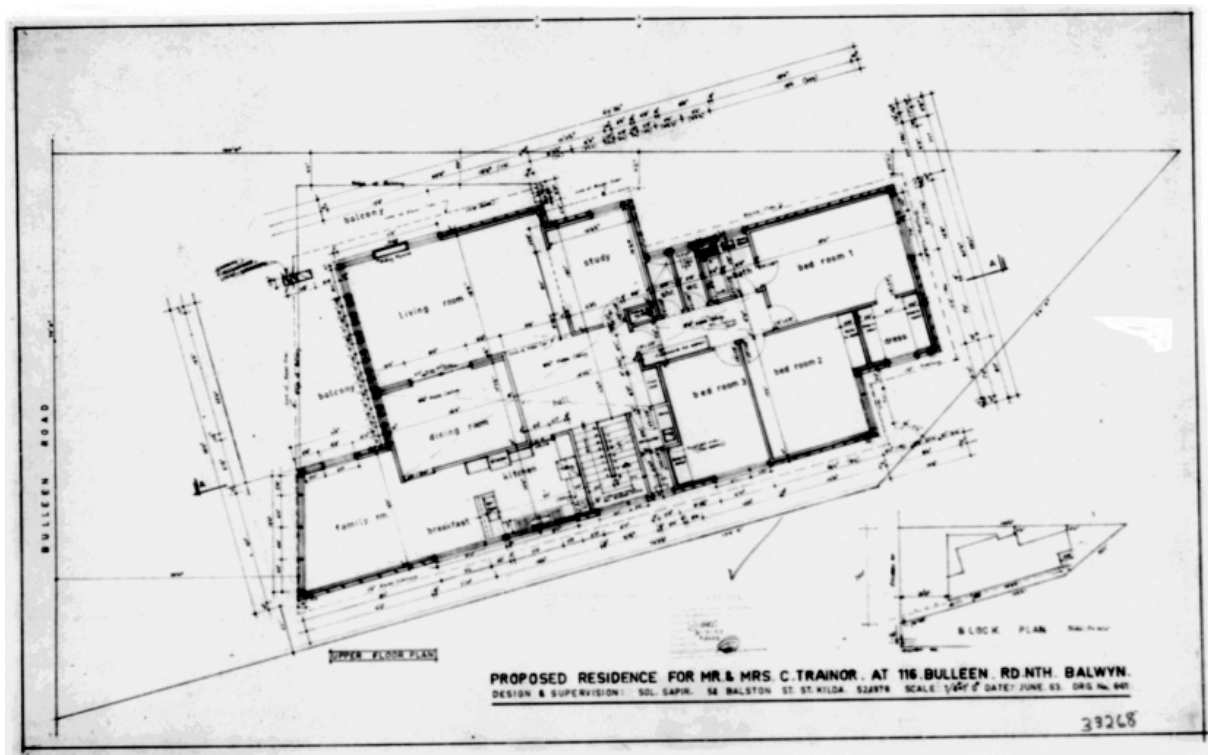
Upper floor plan for 116 Bulleen Road, North Balwyn. (Source: BP 33268)
